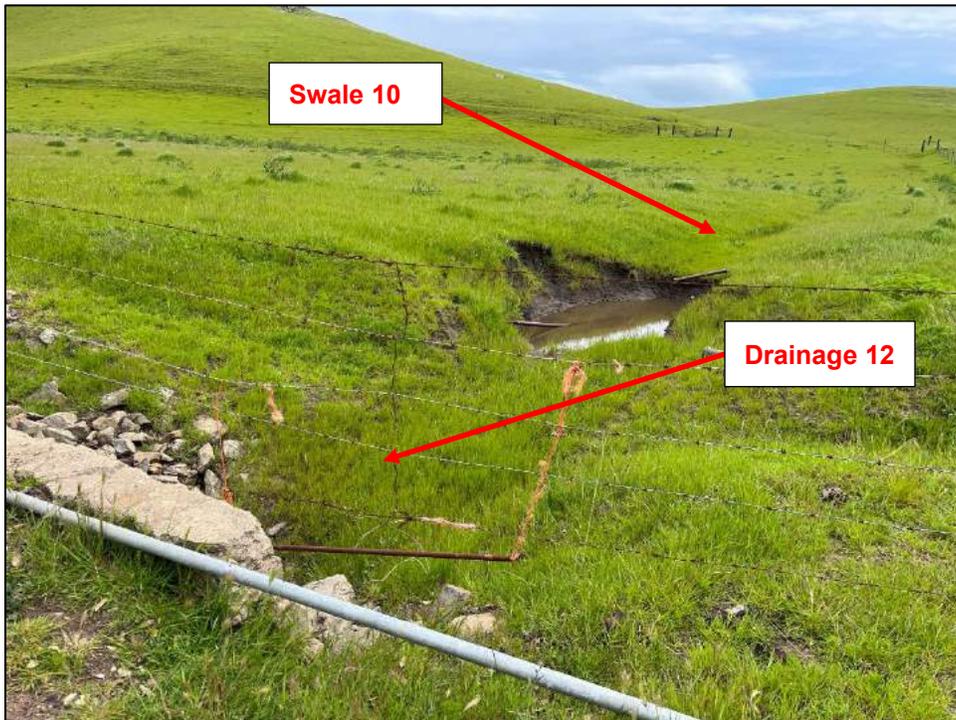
View of Culvert H from San Benito Road, looking northeast towards Swale 10. Photo taken April 6, 2023.
